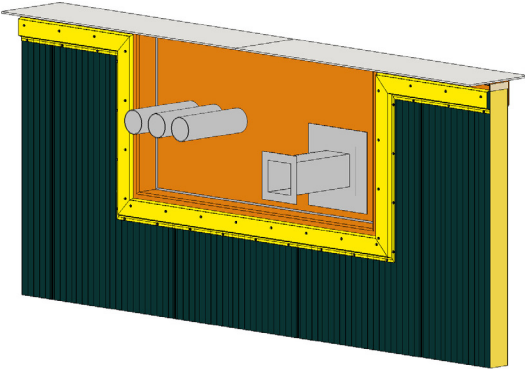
Multi penetration area for Generation IV sandwich wall panels.
